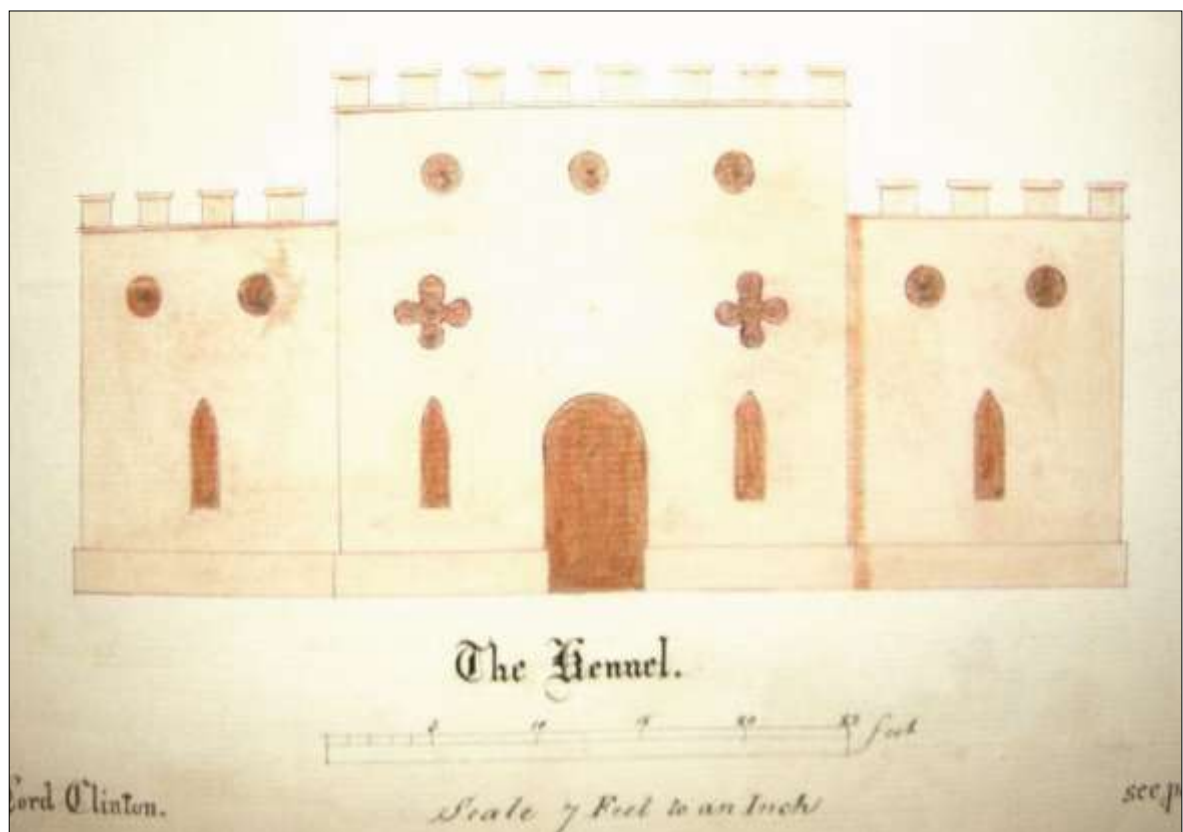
Proposed elevation of the castellated kennels (source: J Rhind 2013).
